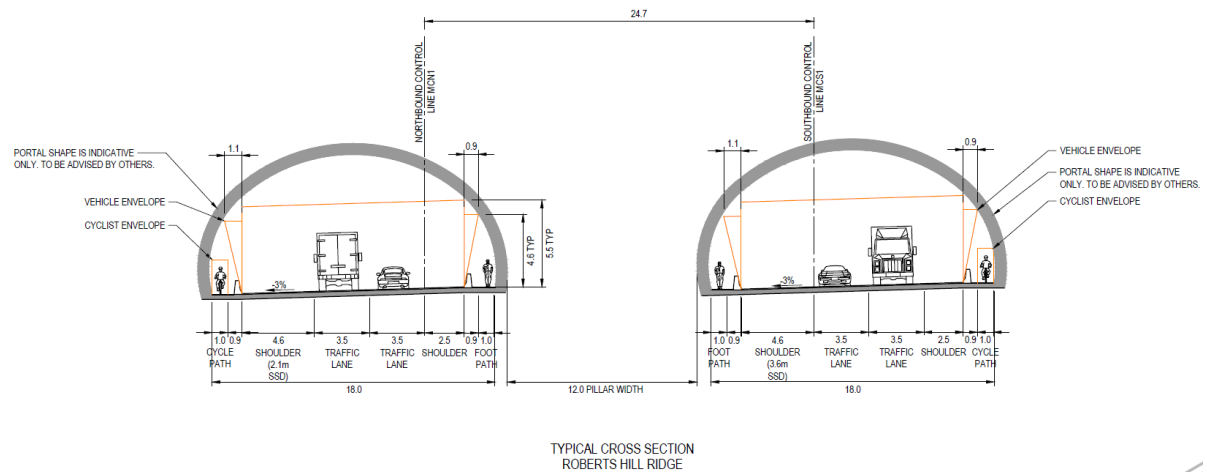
Tunnel cross section for the Roberts Hill Tunnel (subject to detailed design)
